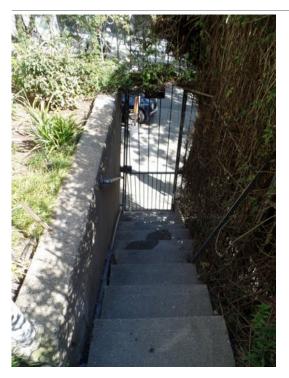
View of entrance gate and stairs to rear (east) elevation. (Photograph by Garavaglia Architecture, Inc., April 2015.)
